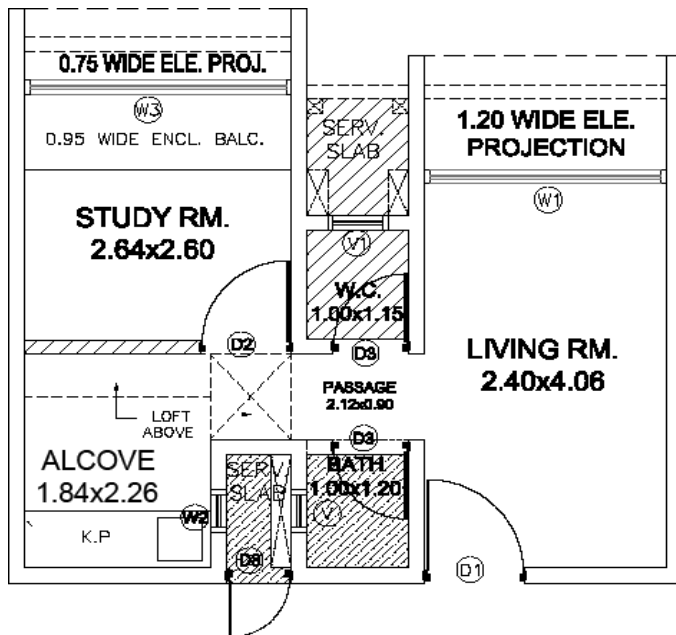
Pragati Towers-Typical Apartment Floor Plan
